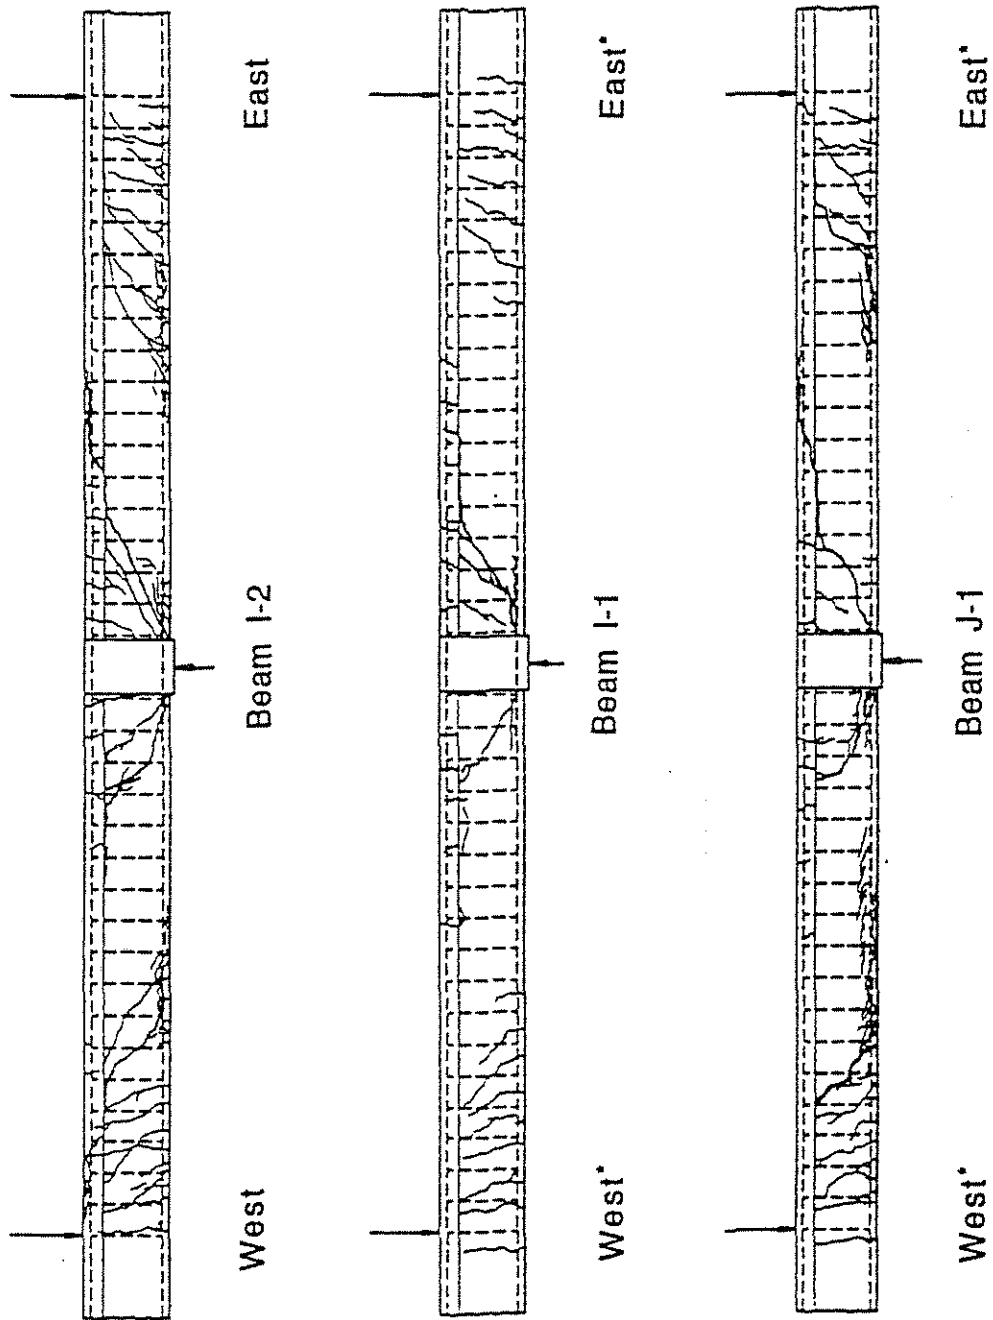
Crack Patterns, Beams I-1, I-2 and J-1 (*indicates span without stirrups).
